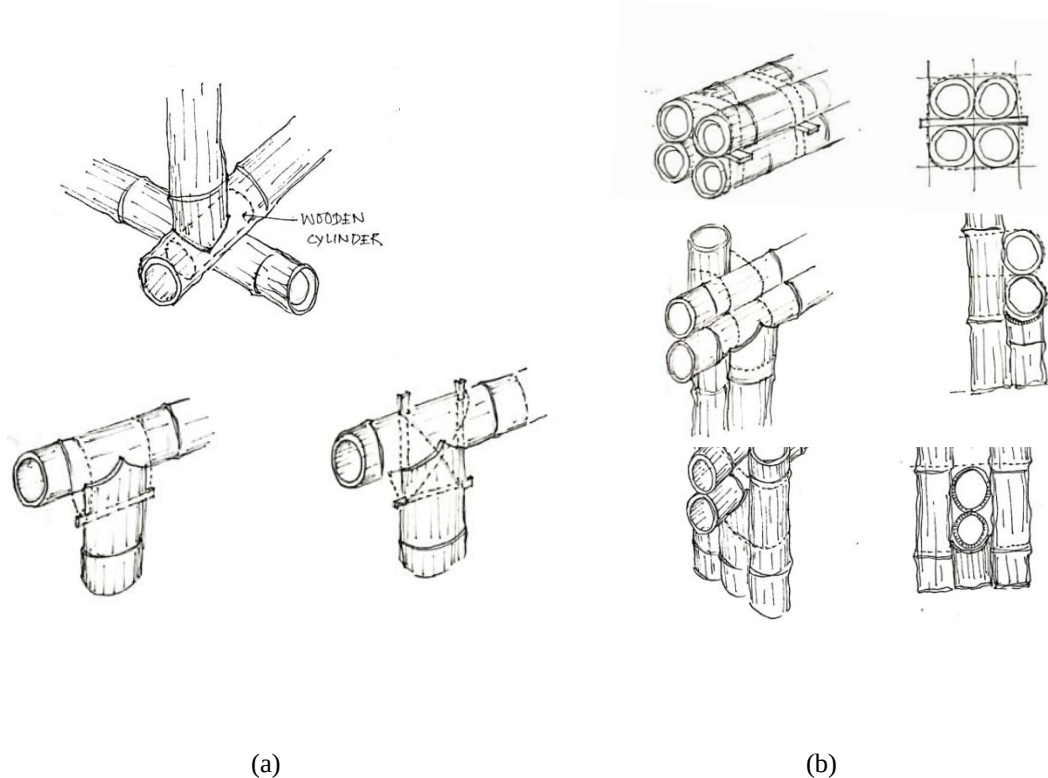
Bamboo joinery detail. (a) Joinery of vertical and horizontal members. (b) Quadruple and double beam joinery detail. Source: Hunnarshala foundation for building technology and innovations, 2013. Sketch: Author, 2021
